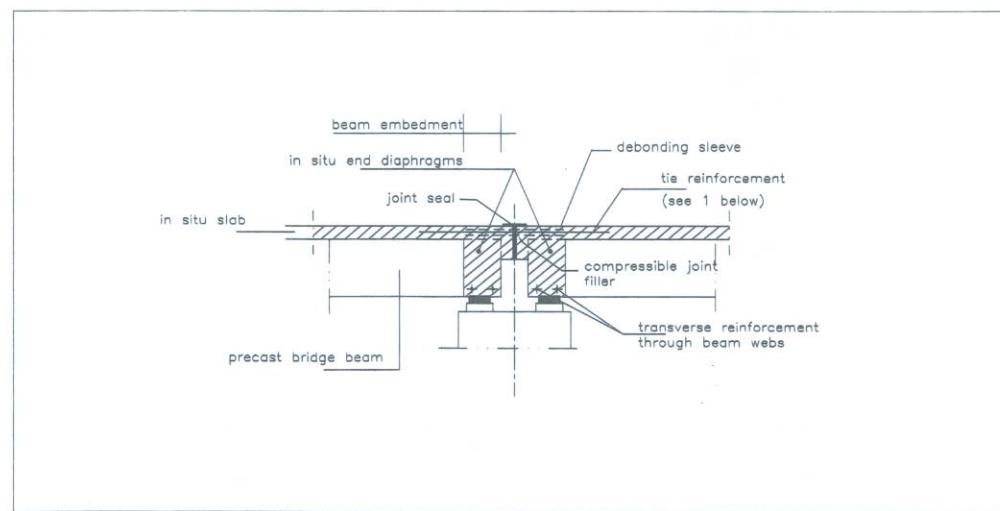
Partial continuity - detail type 2: tied deck slab
